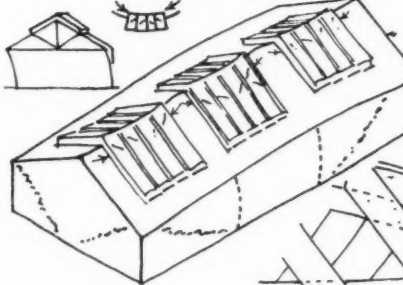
TRIANGULATED TRUSSES ALONE WILL NOT PREVENT DISTORTION IN THE BUILDING & CRACKING OF SKYLIGHTS.
